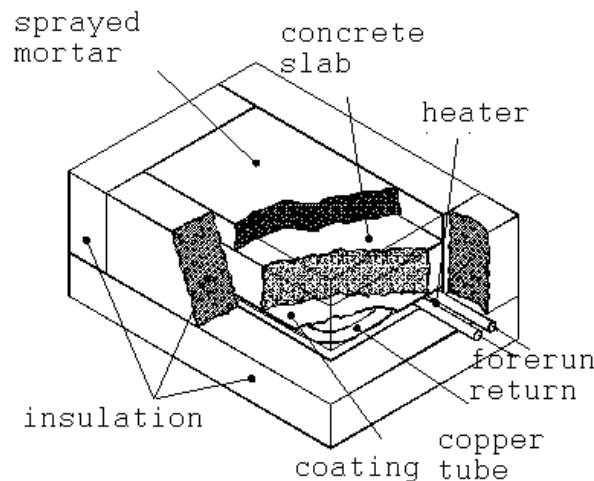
Schematic presentation of the experimental setup - 10 cm thick concrete slab with applied 6 cm shotcrete, coating and heat-insulation and backside heater.
